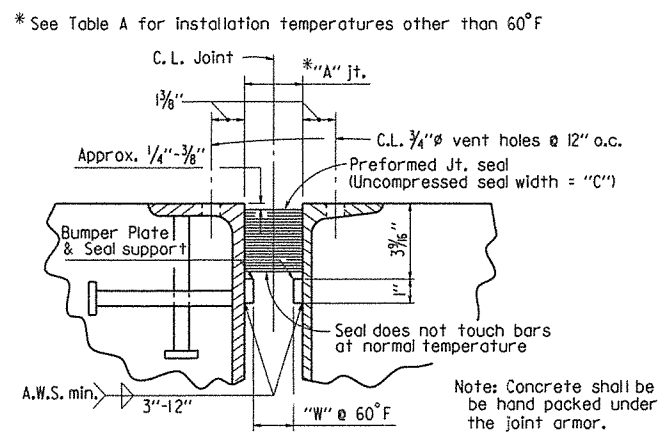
DETAILS FOR BLOCKING EXPANSION JOINT DEVICE
